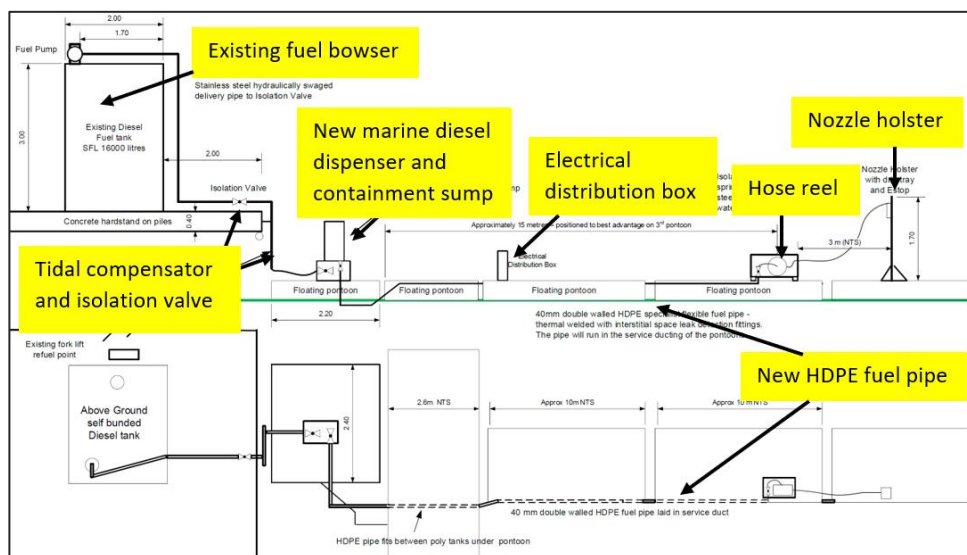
| Proposed site layout (Base source: Applicant's SEE)
